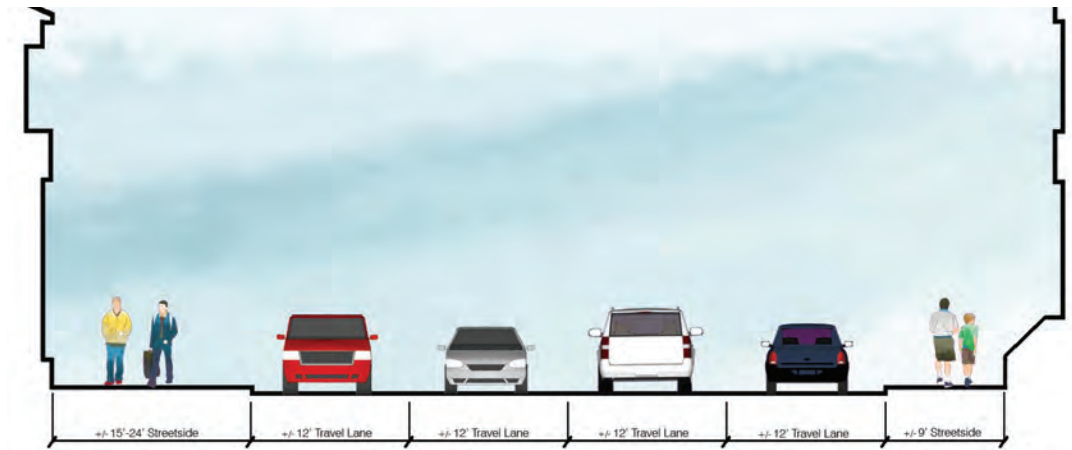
Jones Existing Cross Section – Broadway to Avenue B
